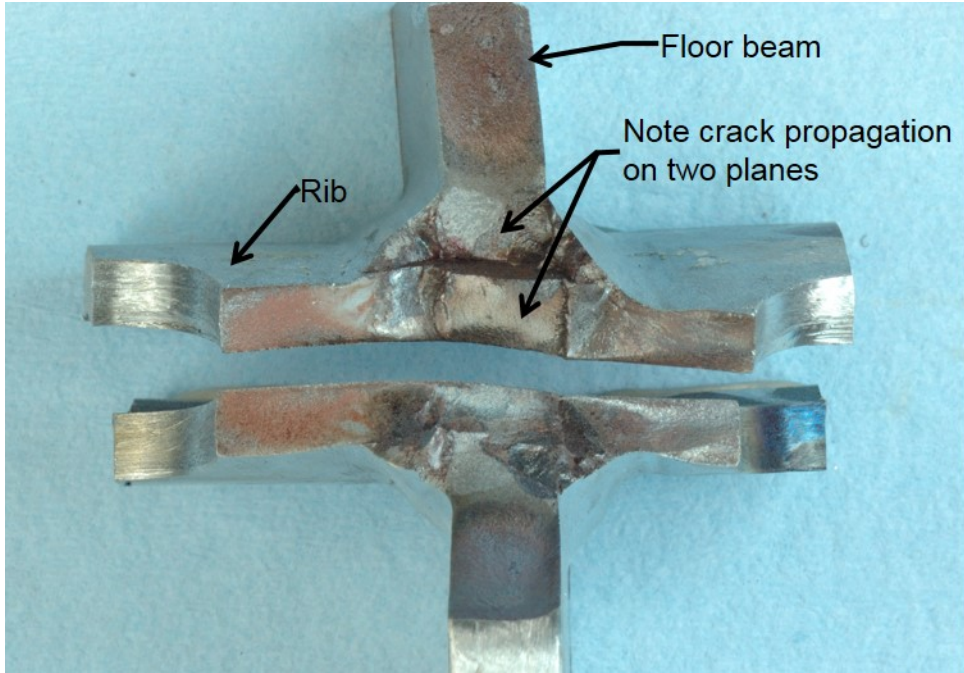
Mating fatigue fracture surfaces for the crack to the south of rib in MU1
